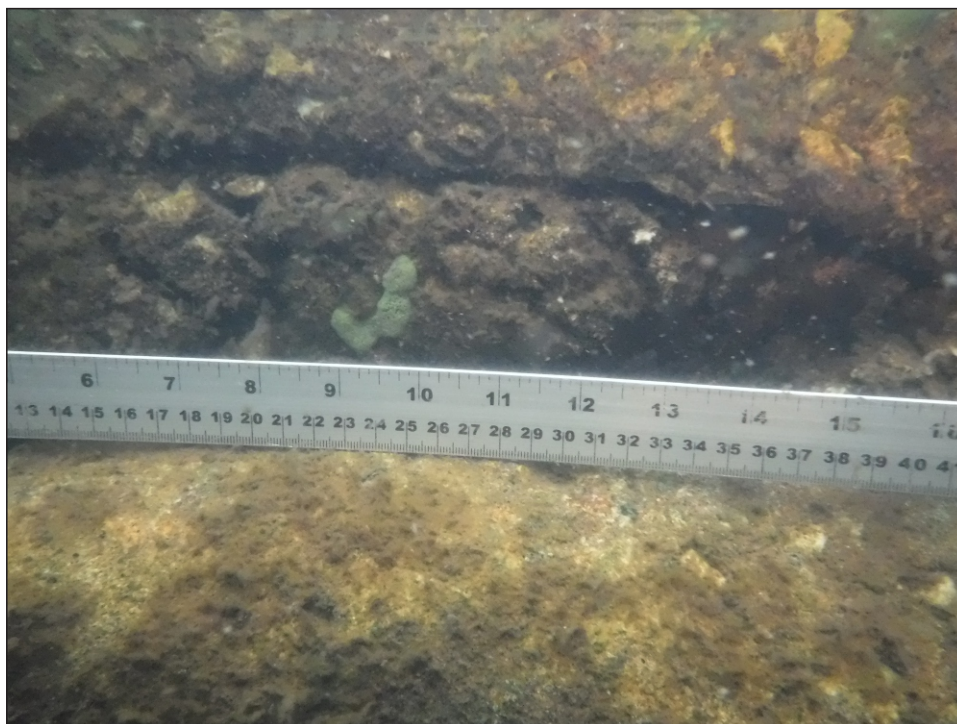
Interface between concrete bag and concrete cap, East Pier
